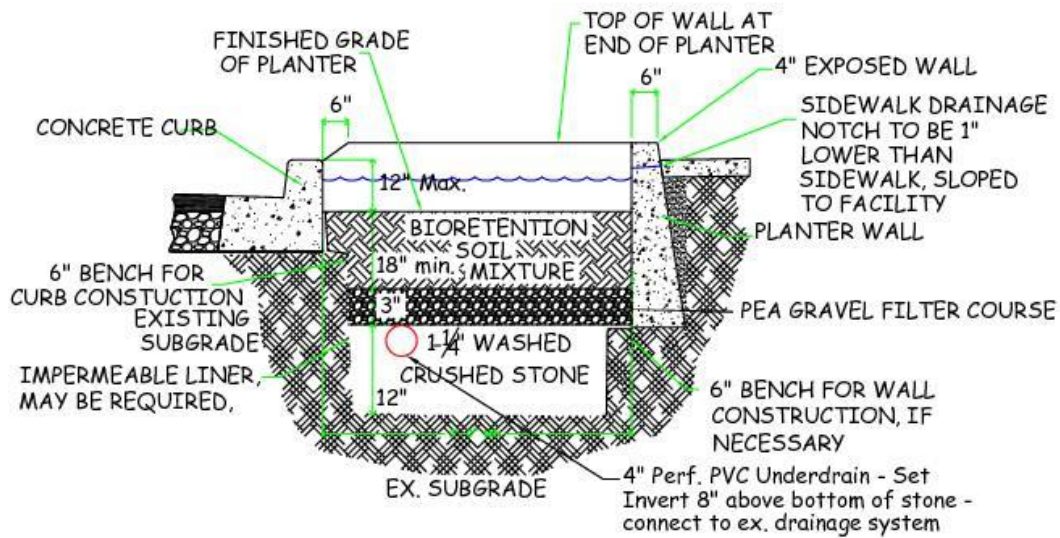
Cross Section of LIRD Curb Extension (Trinkaas Engineering, LLC - 2017)
